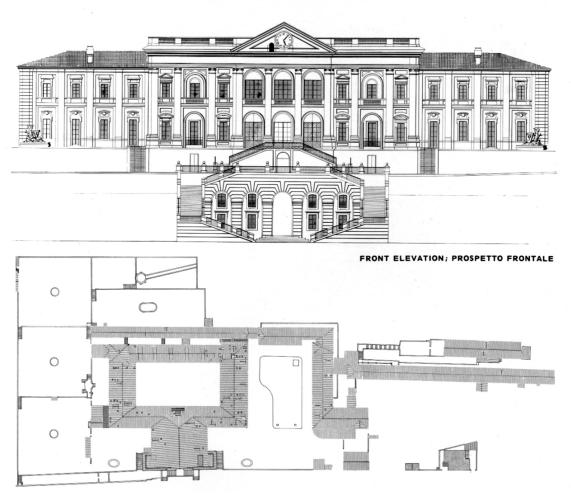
Plan and front elevation of the Belvedere of San Leucio
